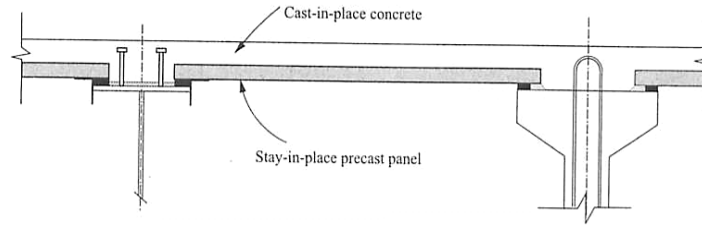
Typical partial-depth precast panel system (Tadros 1998)
